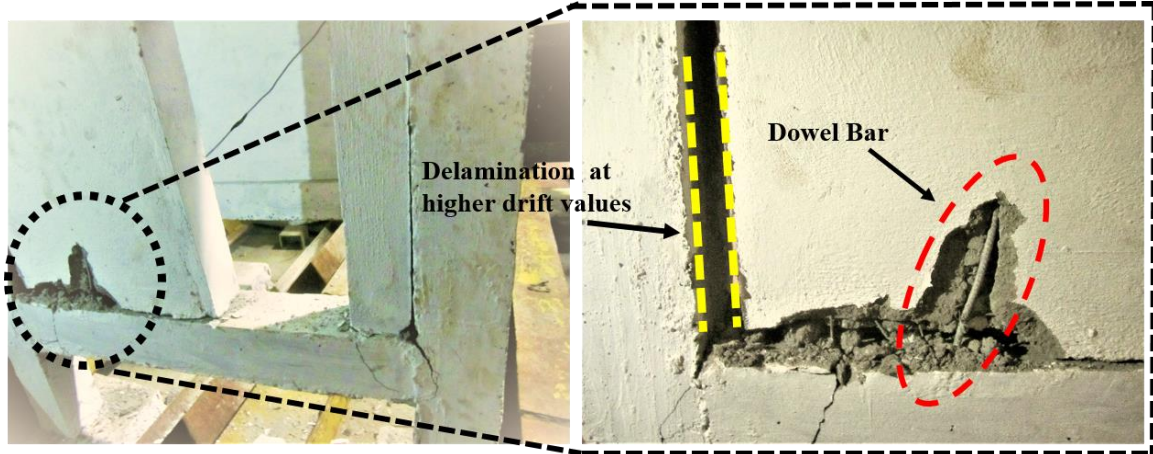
13: Failure of Specimen “O” showing the delamination at 2.65% drift (50 mm) and the exposed dowel bar and reinforcement exposure with spalling of micro concrete.
